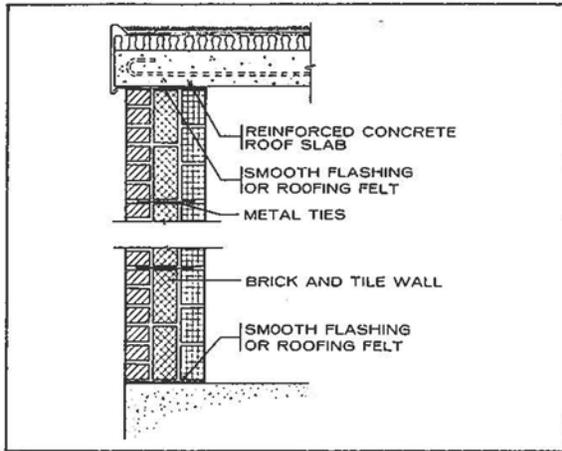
Masonry Details, 1964: Technical Notes on Brick Construction
